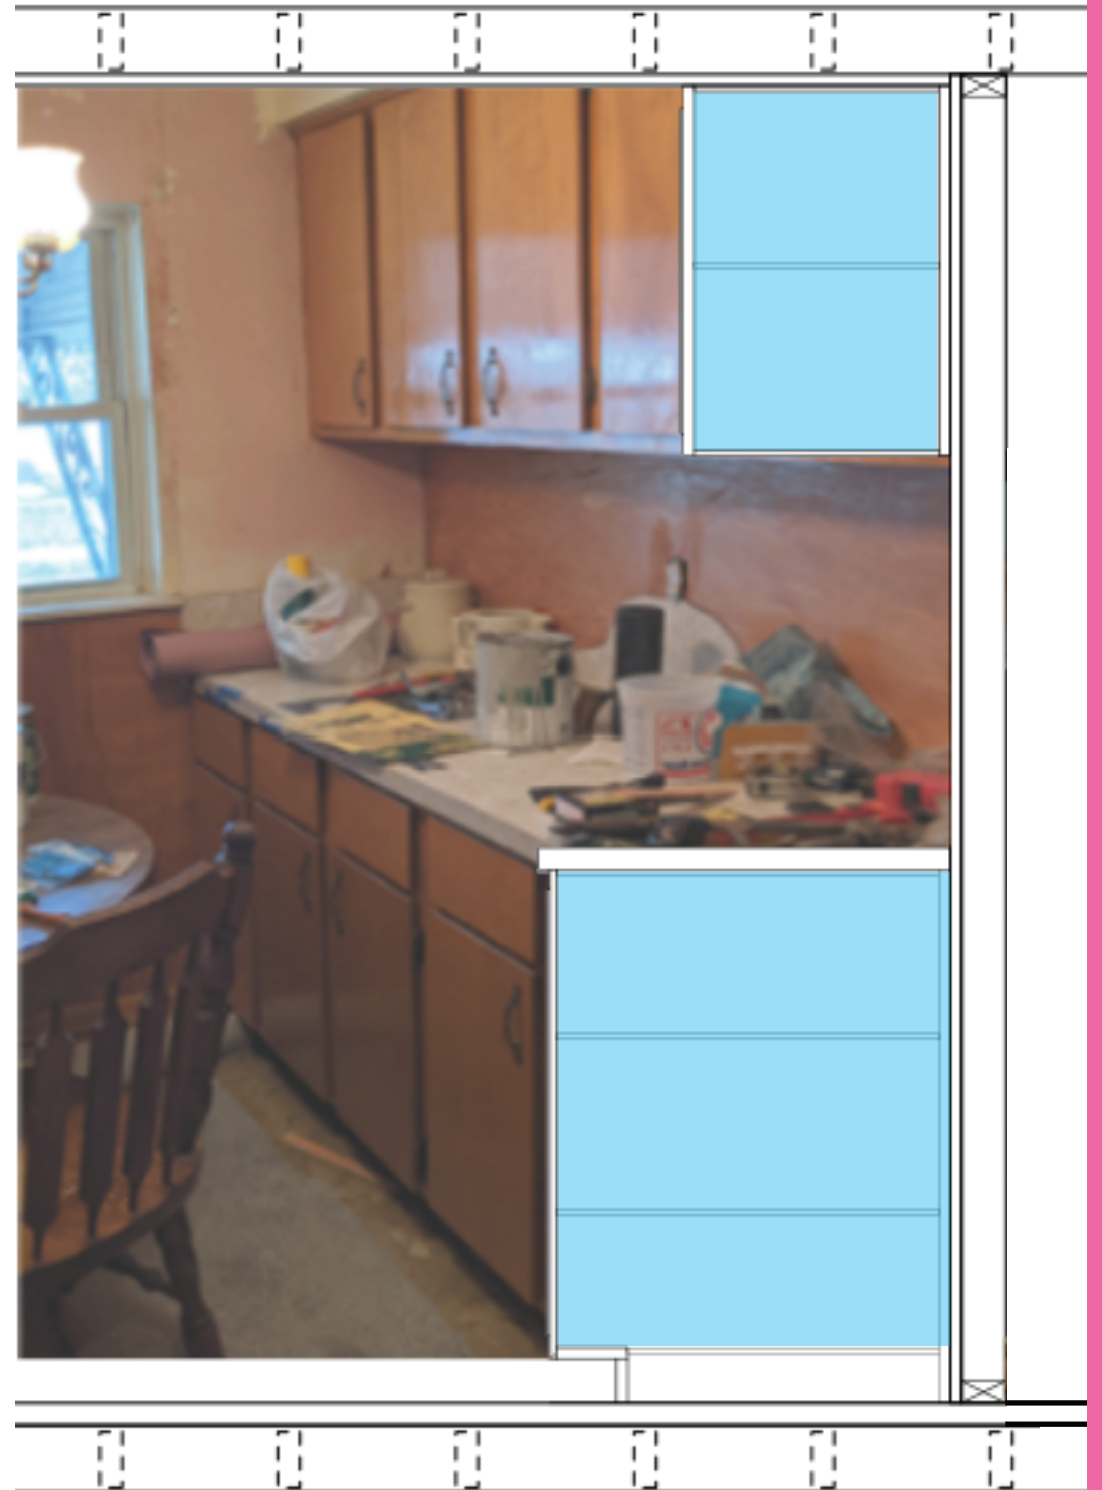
Section Cut through the kitchen mill work and interior walls
